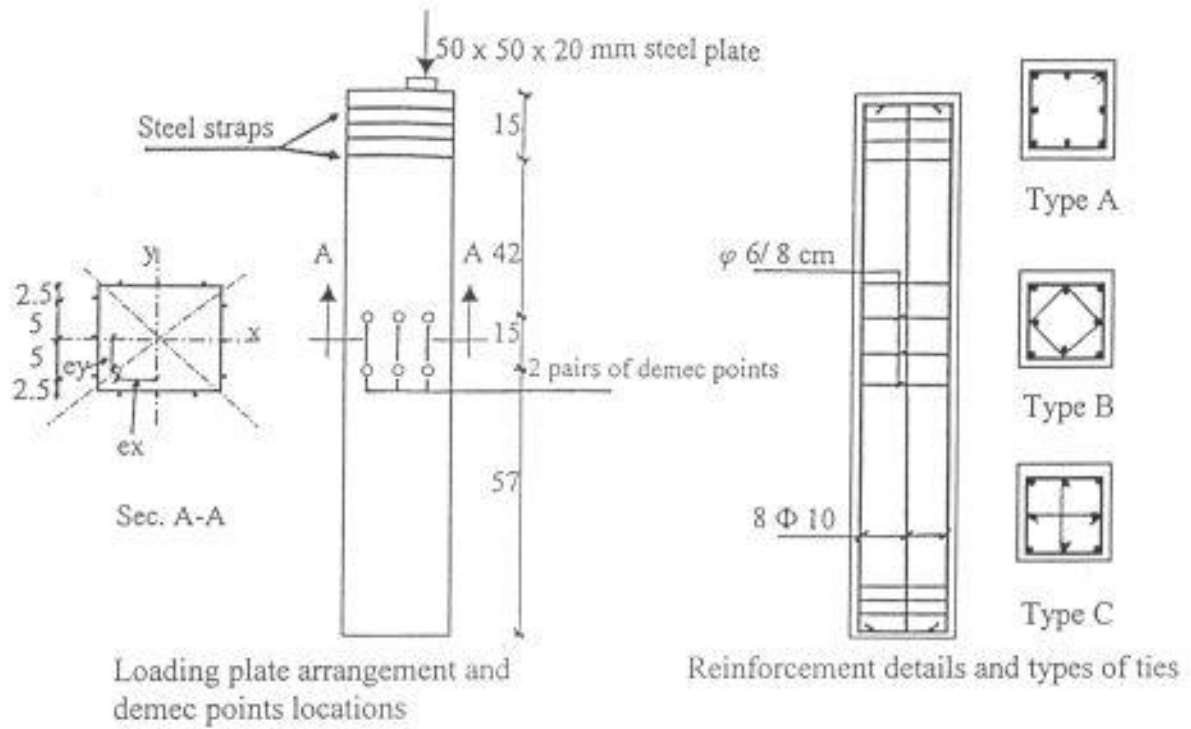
Typical column dimensions, steel reinforcement and measurement locations.
